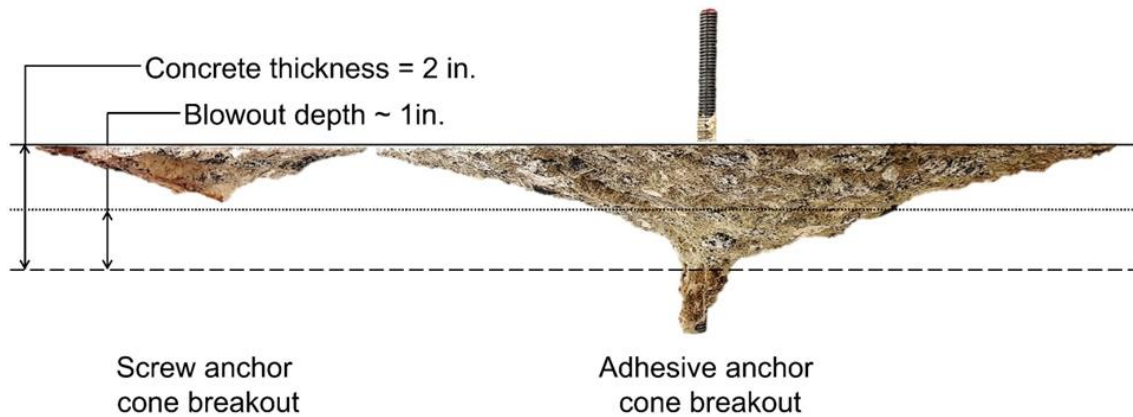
Adhesive and screw anchors concrete cone breakout.
